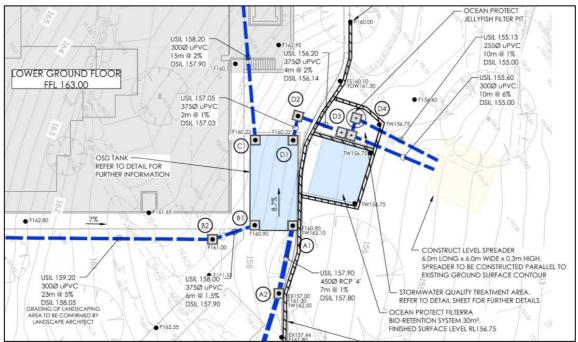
Proposed layout to OSD and WSUD Stormwater Management Layout Source: ENTEC Consultants Pty Ltd
